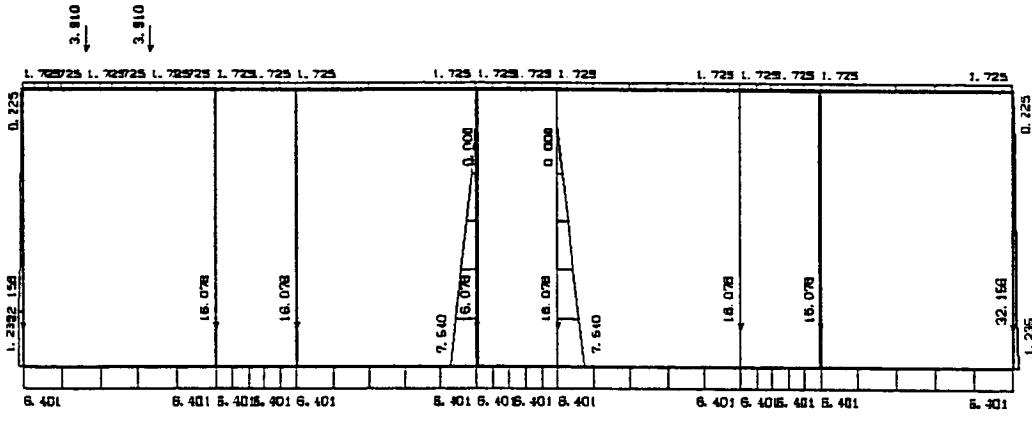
Load and Sectional Force of Flume Section (Case 1)
